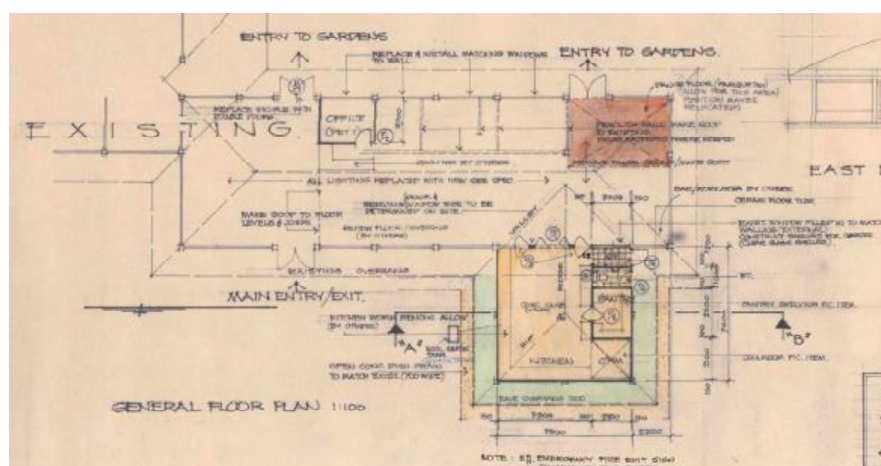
Drawing showing extension to the Cultural Centre in yellow. Source: Archives Cowra Japanese Garden and Cultural Centre
